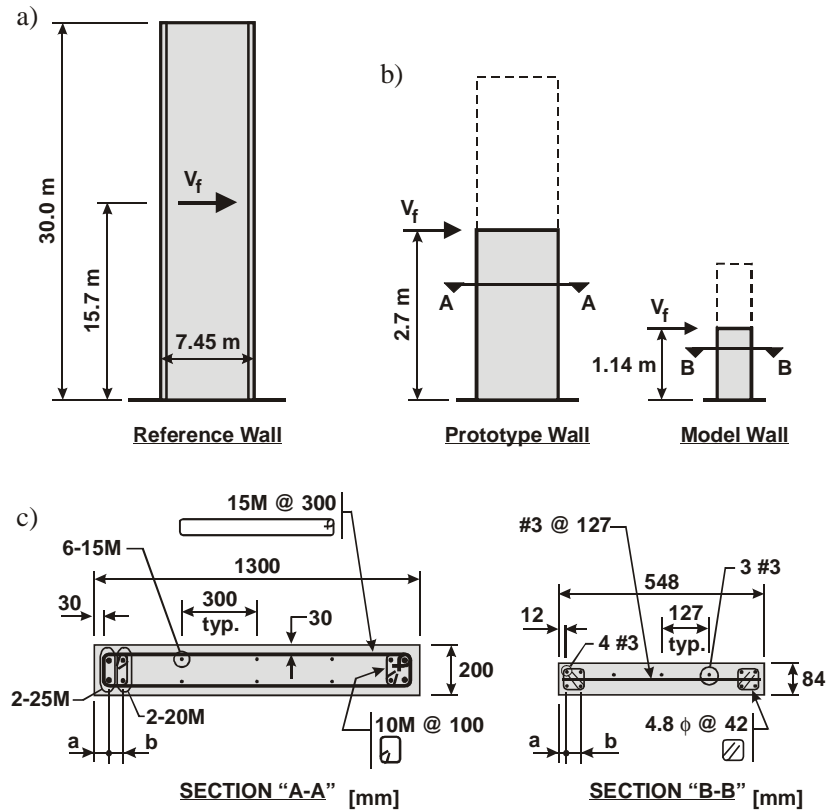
Description of the shear walls studied: a) Reference building wall; b) Schematic elevation of the wall specimens; c) Cross-section of the wall specimens (End A at right, End B at left) (25.4 mm = 1 in. ; 0.305 m = 1 ft).
